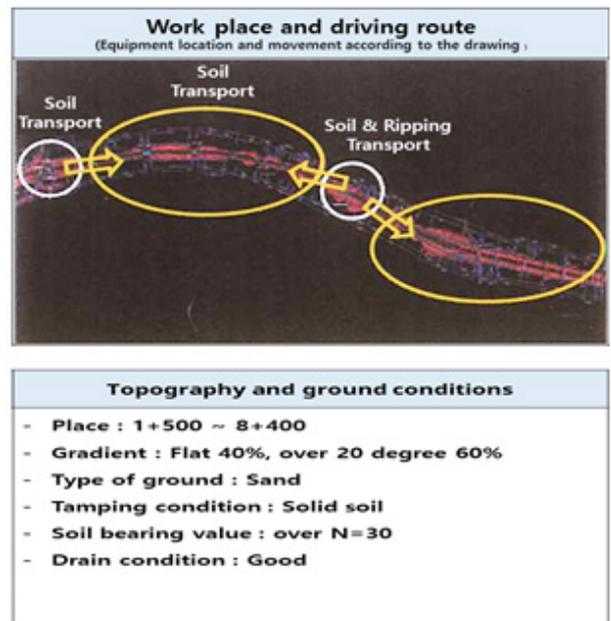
Work plan for construction equipment (Lee et al., 2021)
